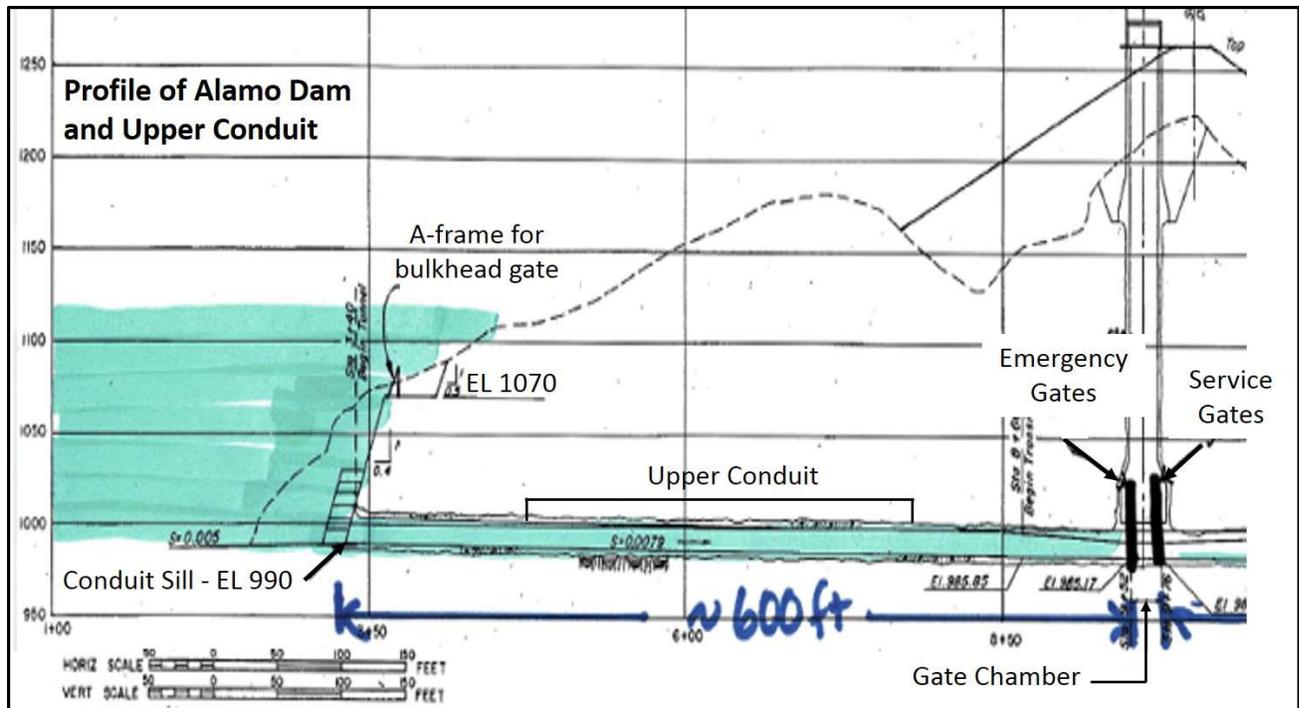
Profile of the Alamo Dam showing the bulkhead gate A-frame, upper conduit, and gate chamber.
